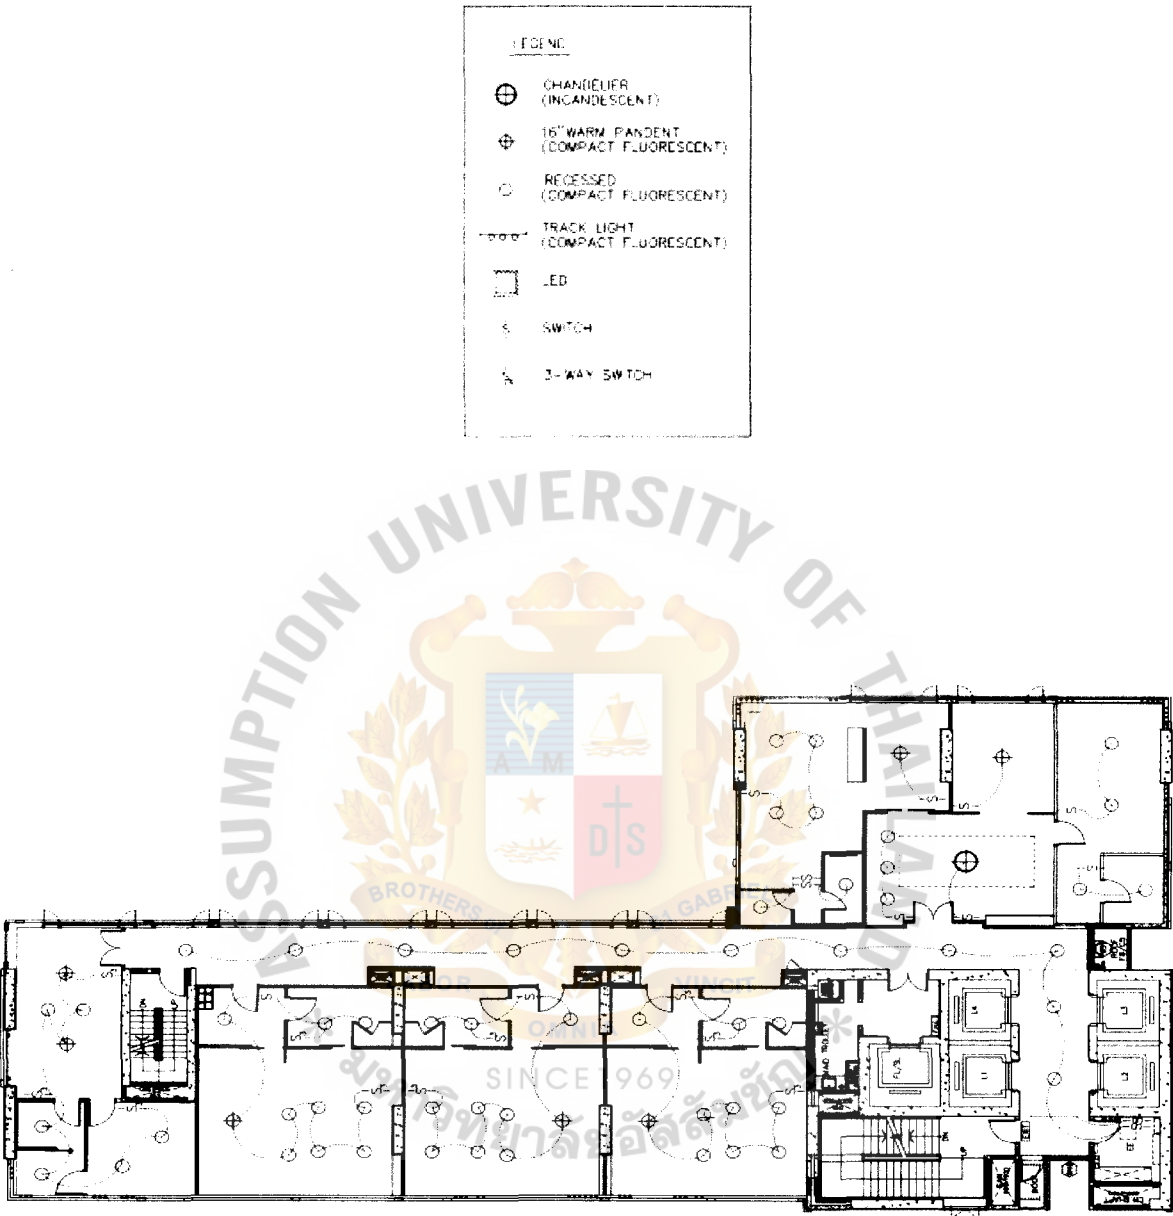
Reflected Ceiling and Lighting Plan of 31st floor plan
